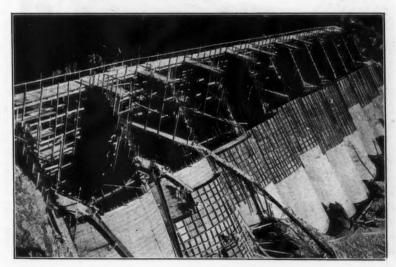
Gem Lake Dam, Showing Section of Up-stream Form being Hoisted into Place, Also Main Upper Runway with Branches Along Buttresses.
